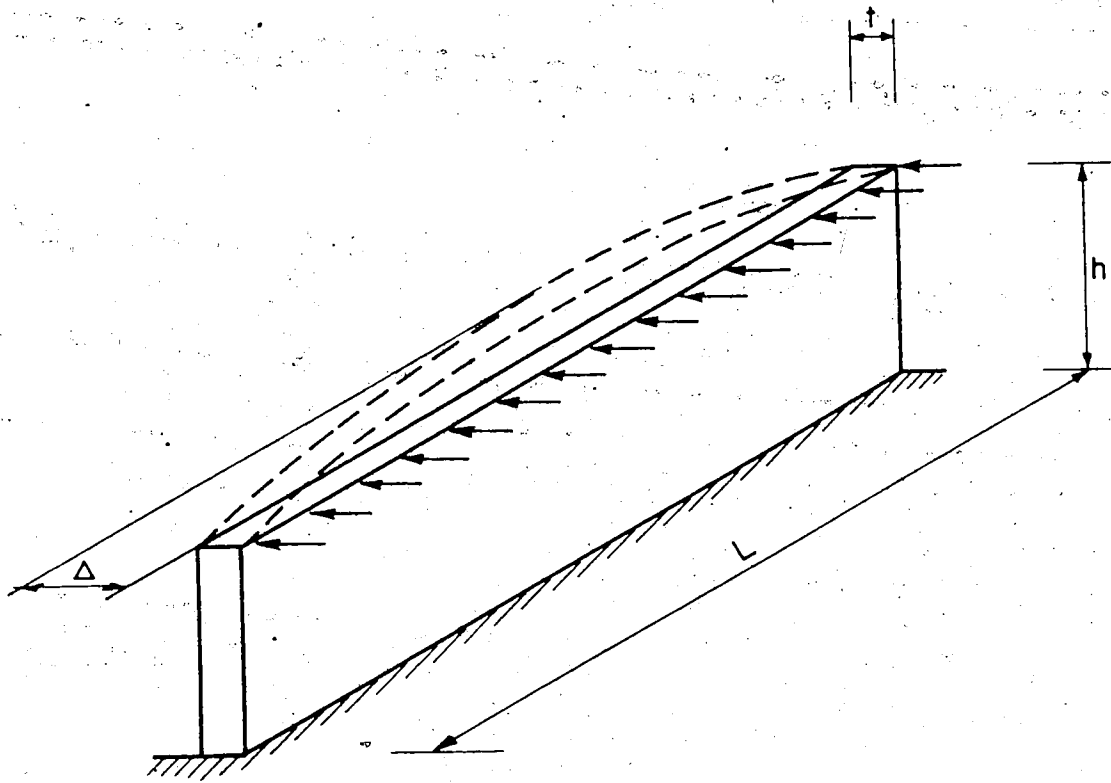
DEFORMED SHAPE OF MASONRY WALL
